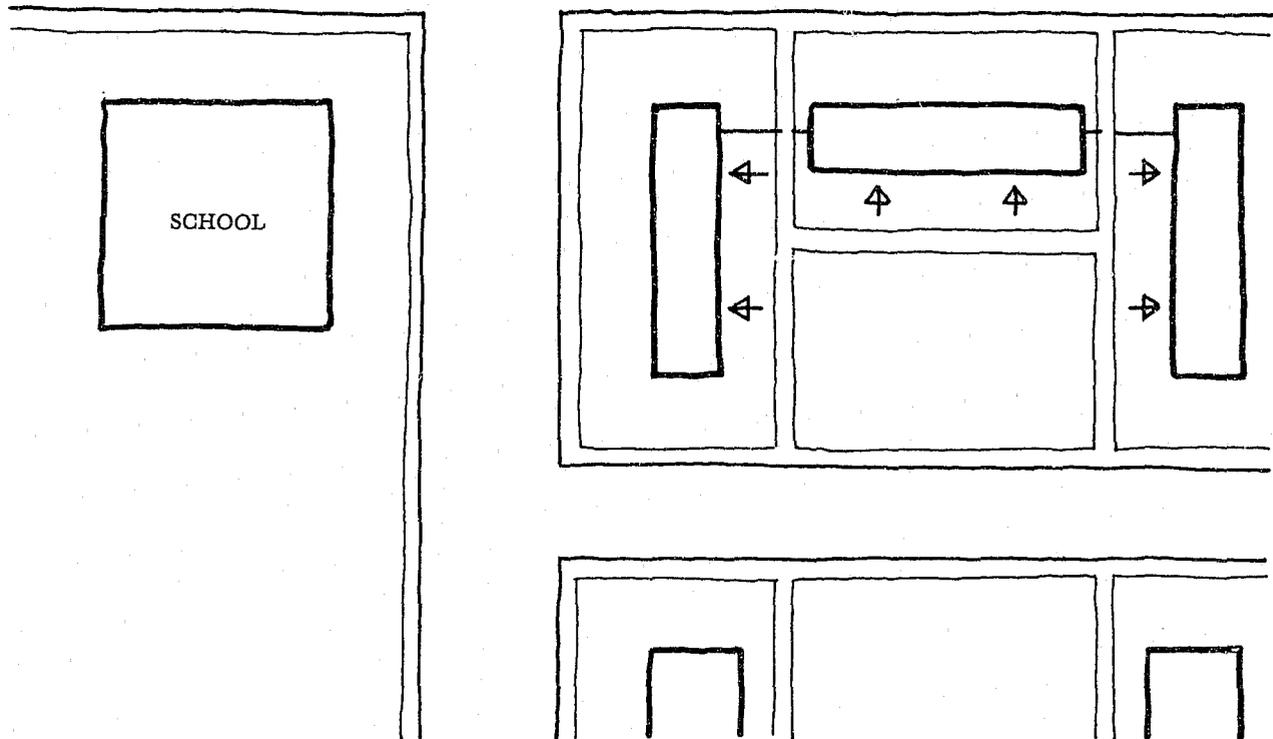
Site plan. Site plan designed so that access to apartment buildings is not from the streets directly opposite the school.
